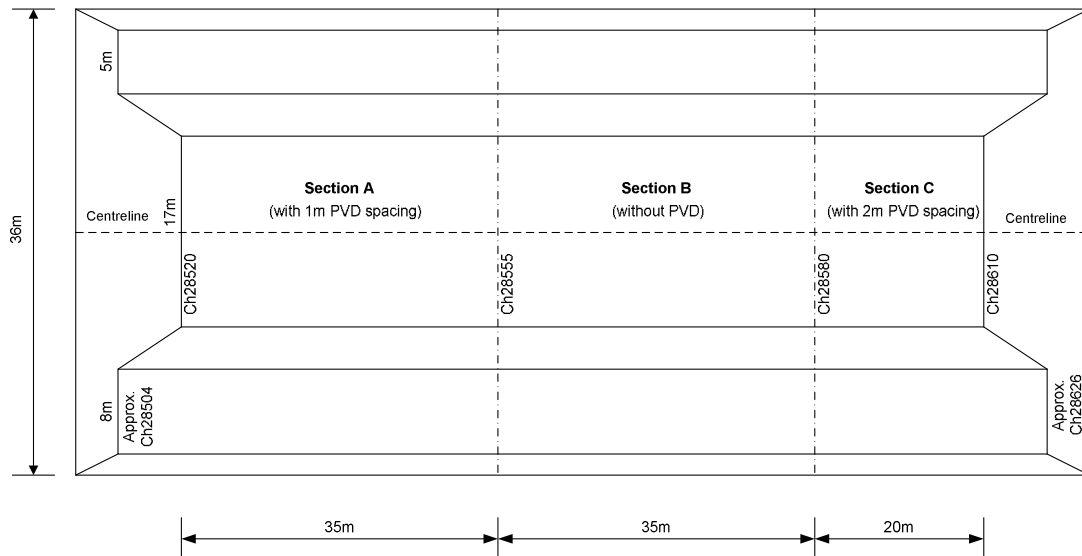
(a) Locations and Dimensions of Test Embankment with Section A (with 1m PVD spacing), Section B (without PVD) and Section C (with 2m PVD spacing)
